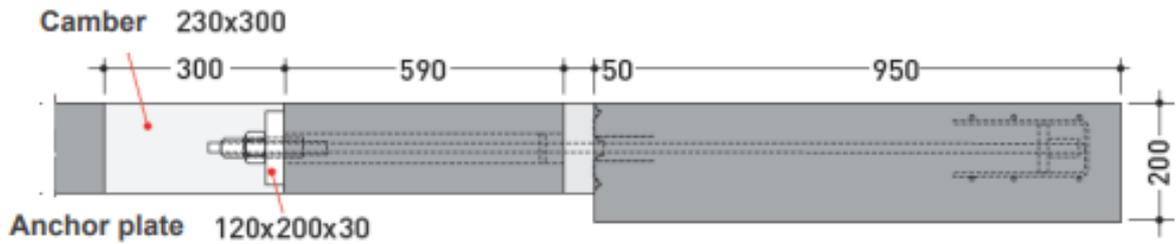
9: Section of fixation of precast element to existing structure using post-tension connection
